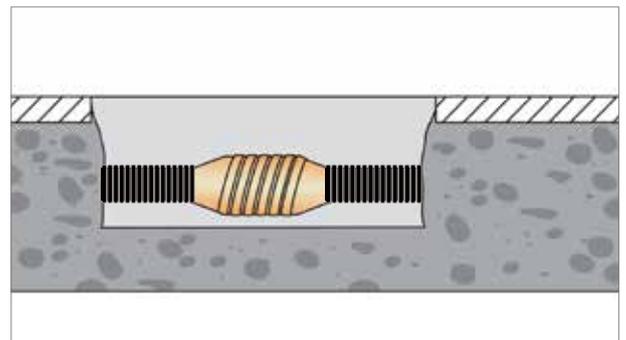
Installation of PINC™ system within concrete/screed floor with corrosion protection system
